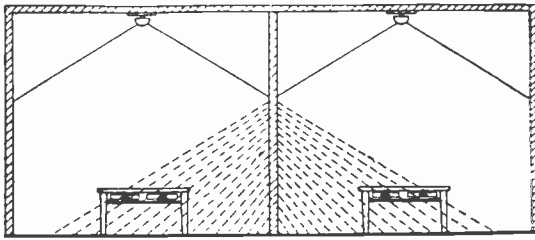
This sketch shows how the walls of narrow rooms absorb a certain amount of the light. If the wall in this case was removed and the room was twice as wide, note how the light beams from the two lamps would overlap and produce more light on the benches.
